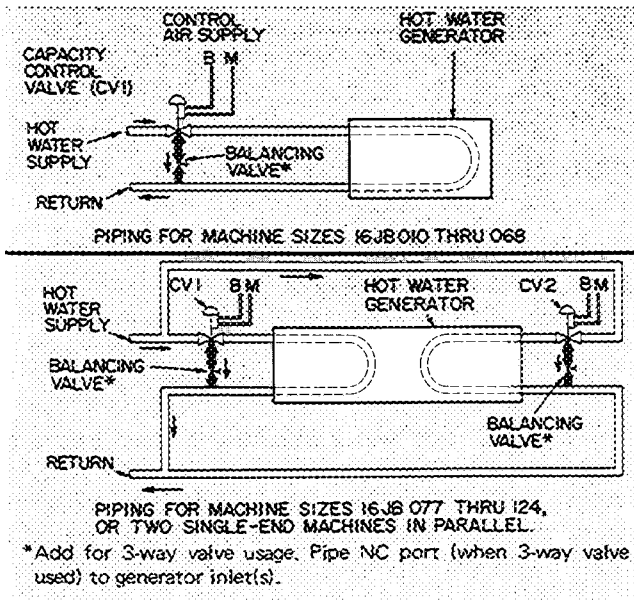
Suggested Piping For Hot Water Machines Using Supply Hot Water 300 F or Below
